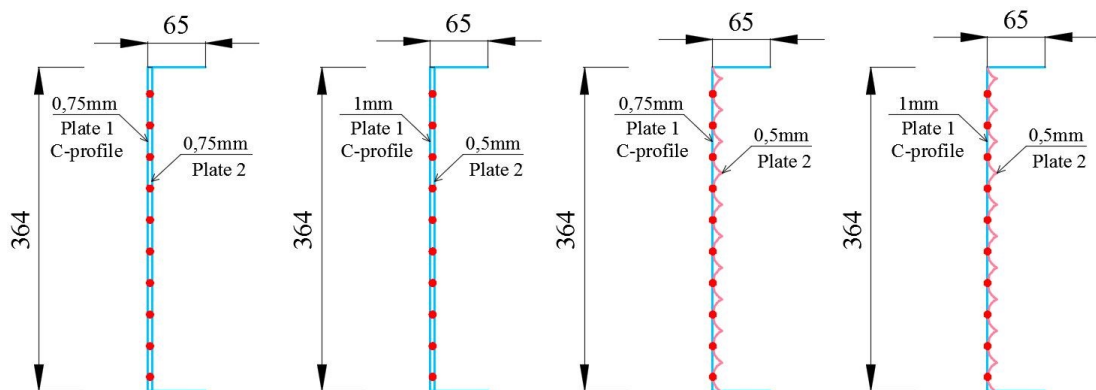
Cross sections of specimen types 1,2,3 and 4
